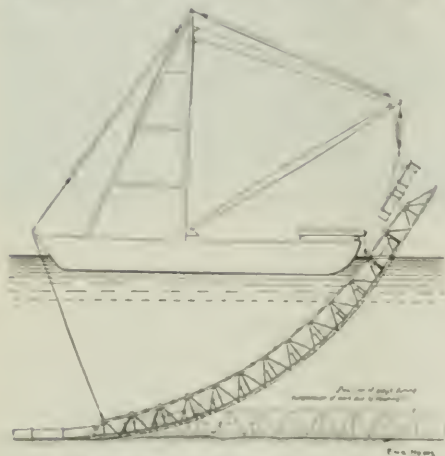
DETAIL OF PIPE-LAYING CRADLE
